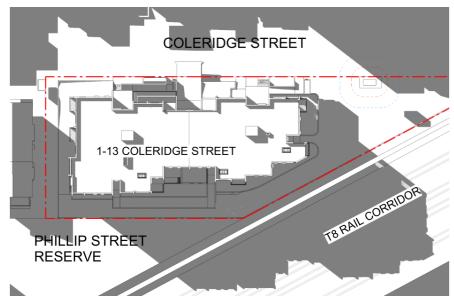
Excerpt from the Architectural Plans – Shadow diagram at 3pm midwinter (Source: WMK Architecture)
